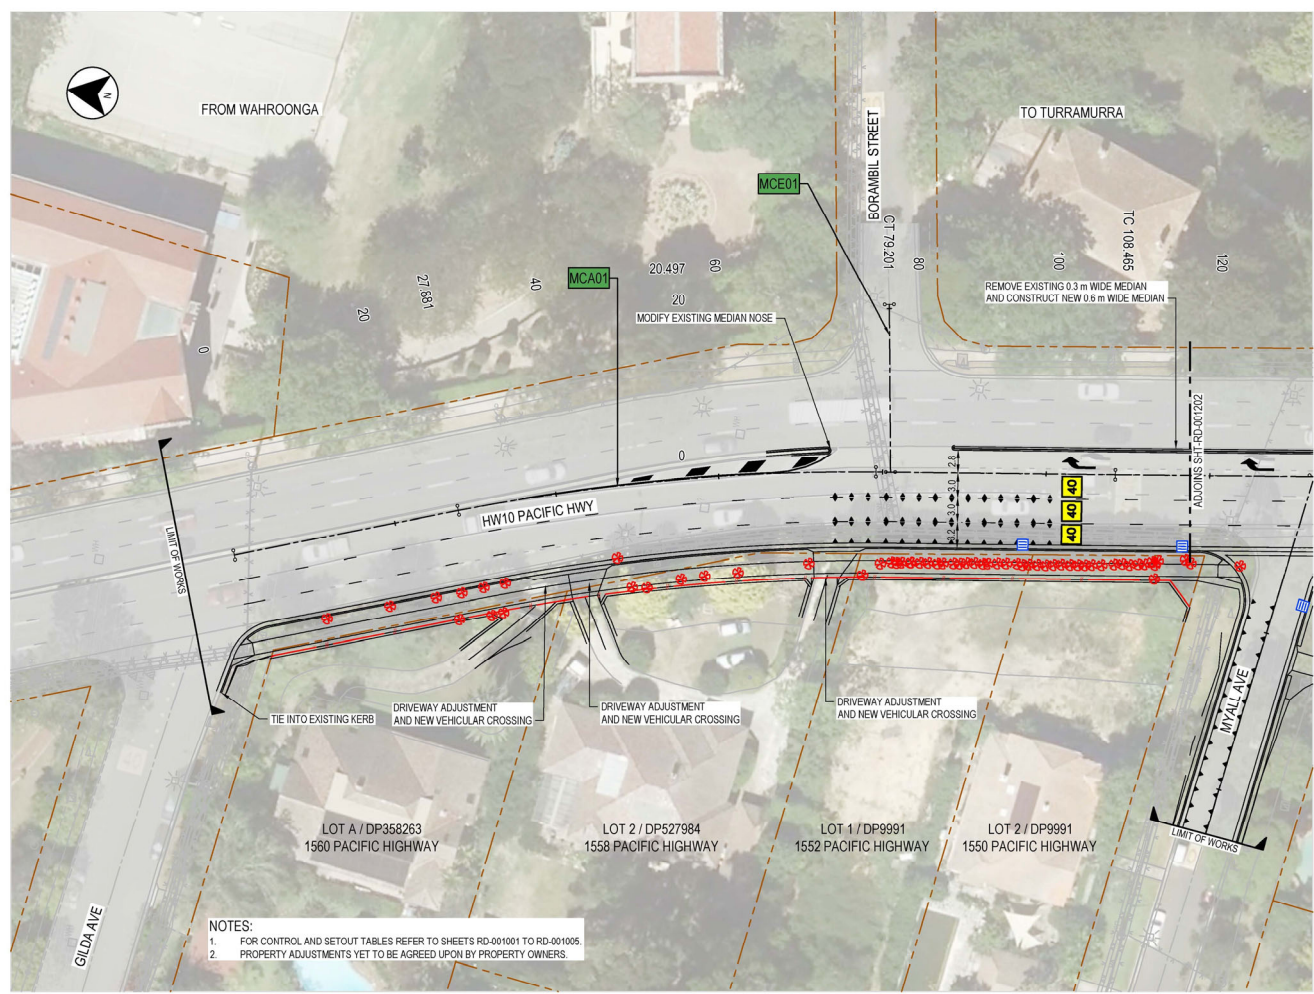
The proposal design – Intersection 1 (Pacific Highway at Finlay Road, Warrawee/Turrumurra) – Sheet 3 of 3
